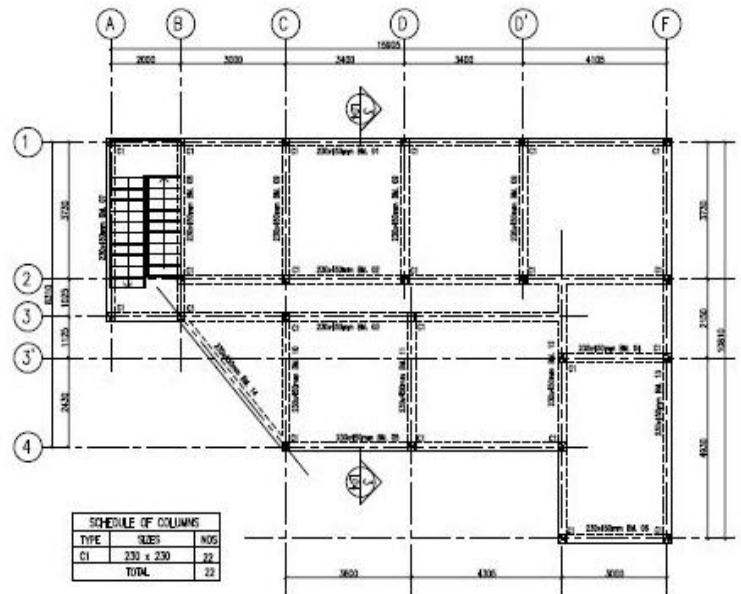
Structural plan of an Office complex located at Akure, Ondo State, Nigeria.
